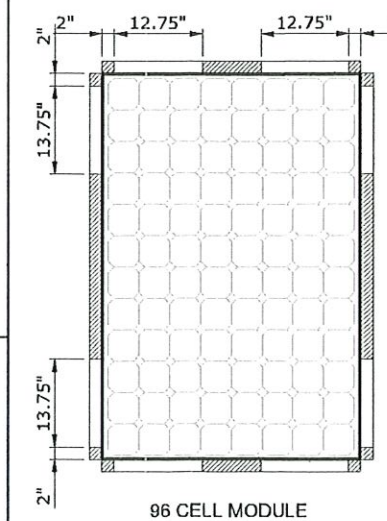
MOUNTING CLAMP POSITIONING DETAILS
